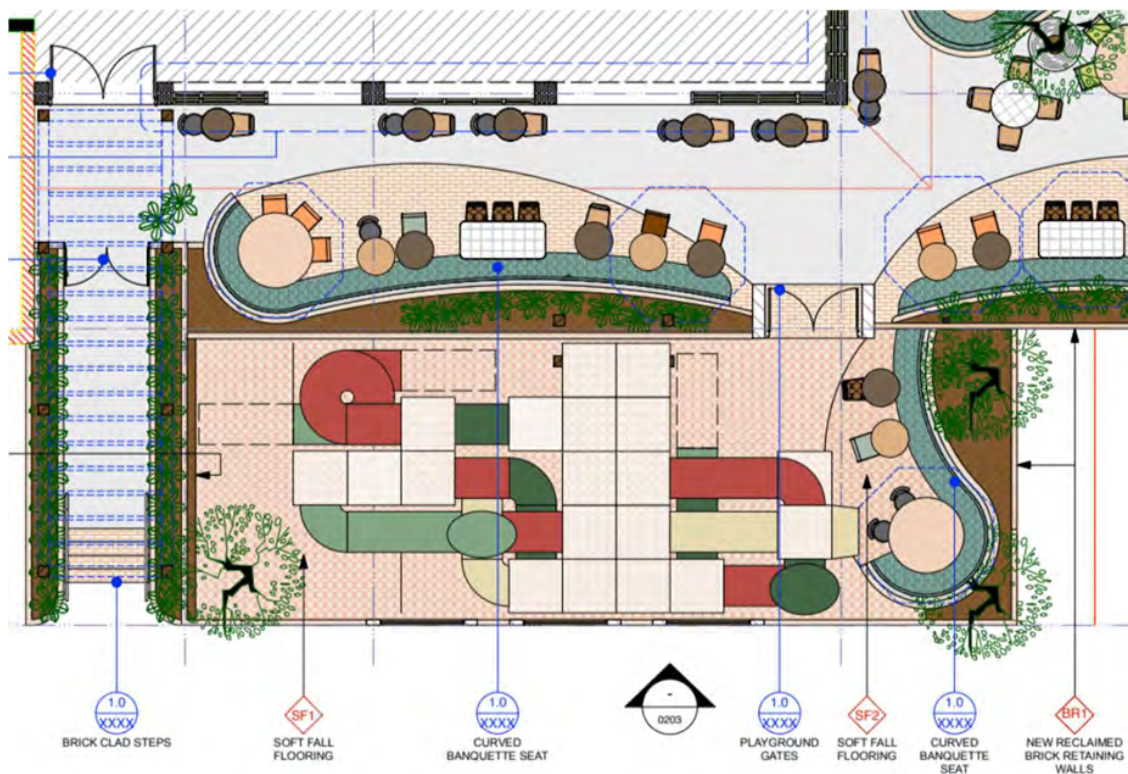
Ground Floor Plan (rotated) showing Children's Playground and gates (as Control Point)
